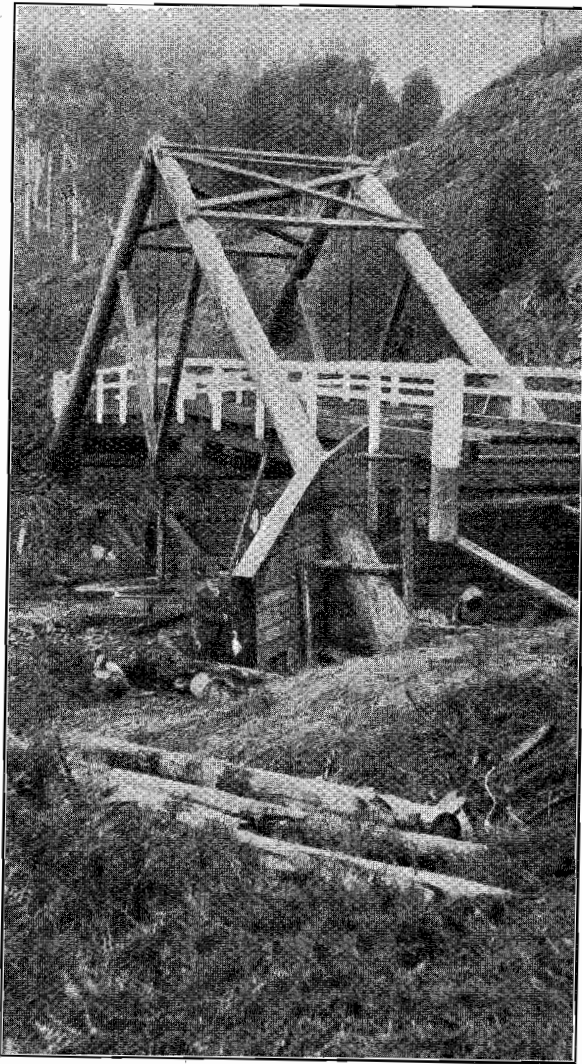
Bridge (under construction) over Merriman's Creek.
